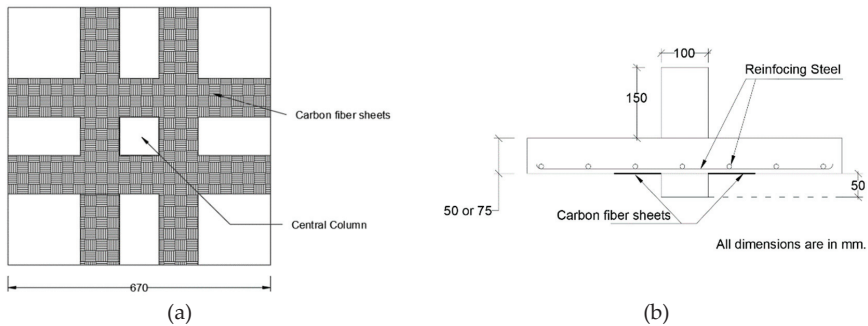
Test specimens for orthogonal CFRP strengthening strips, (a) CFRP strip pattern applied to tension side and (b) loading column and slab specimen dimensions [27].
